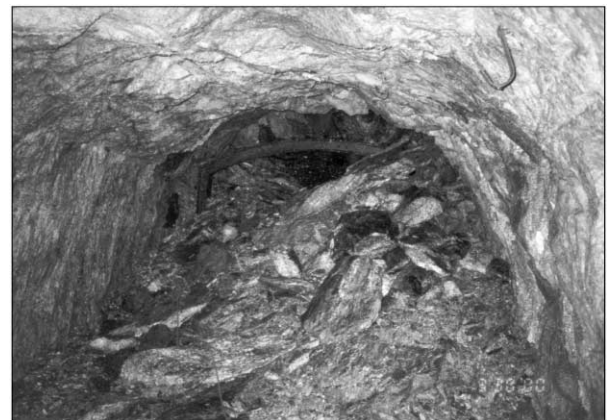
Major brittle spalling along an abandoned section of the Furka access tunnel "Fenster Bedretto".
